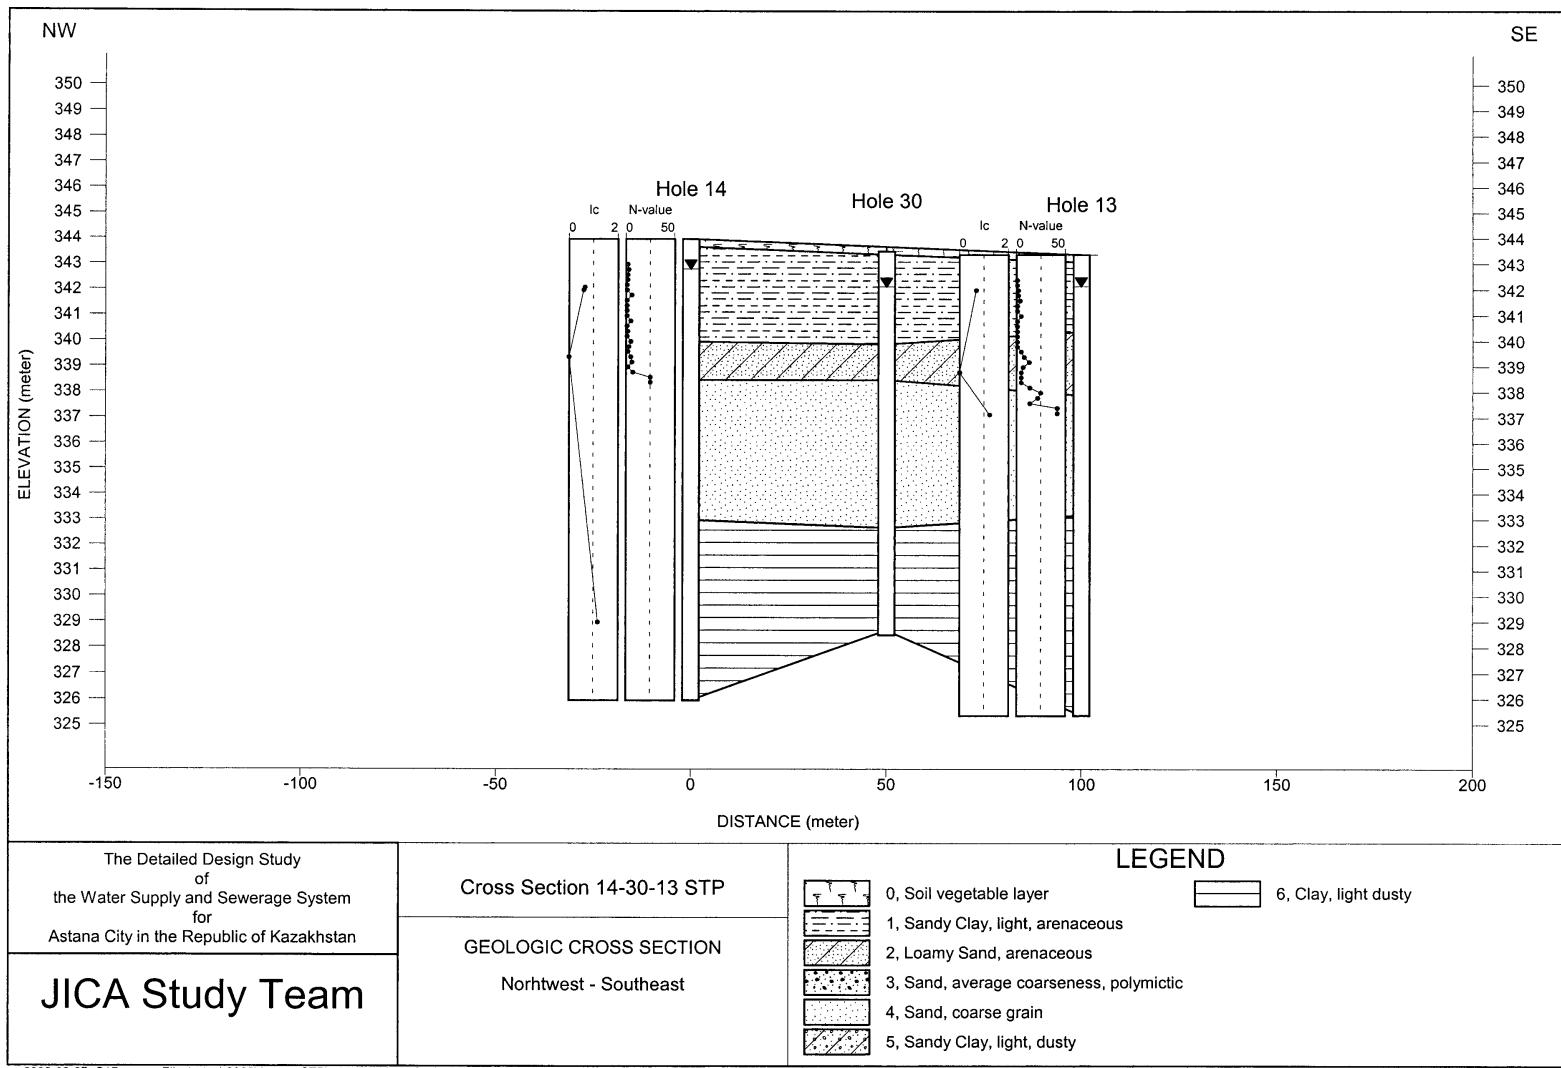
(2) Geological Cross Section at Sewerage Treatment Plant (2/9, Line No. 14-30-13)
